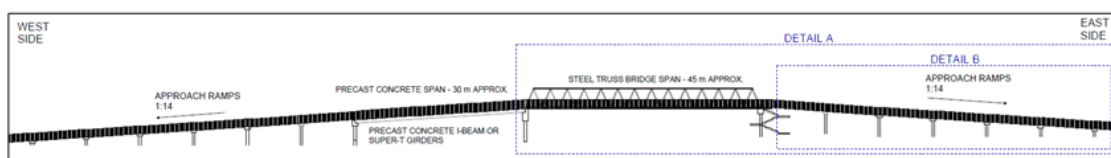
Stage 2 Concept Plans (Cumberland Hwy Overbridge in elevation)
